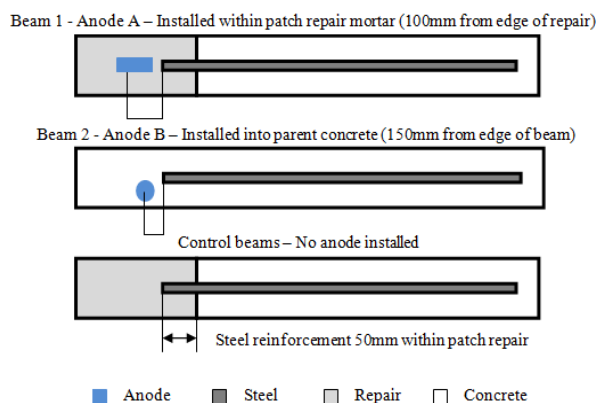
Arrangement of reinforced concrete specimens and patch repairs
